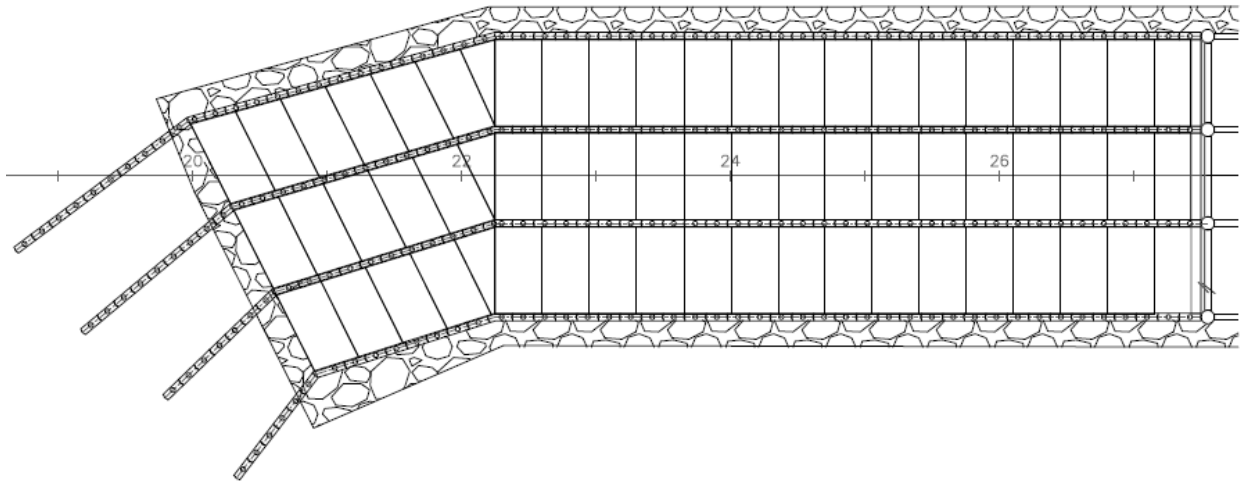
Alt. C - Plan View of a Detail of the Inlet/Approach Channel
